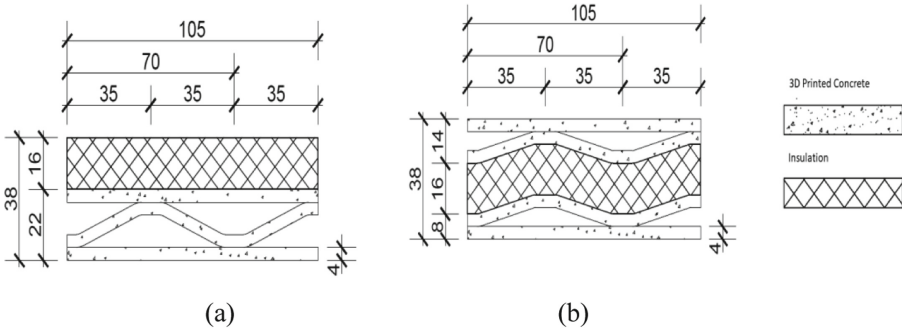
Top view of the different wall types: (a) structural wall and (b) insulated wall (dimensions in [cm])
